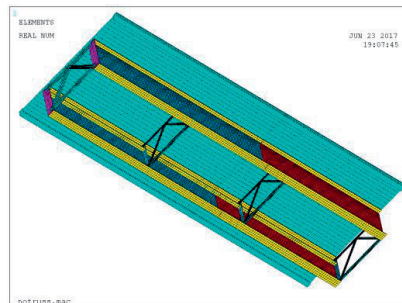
Bridge segment of the bridge from the below, no horizontal truss is showed.
